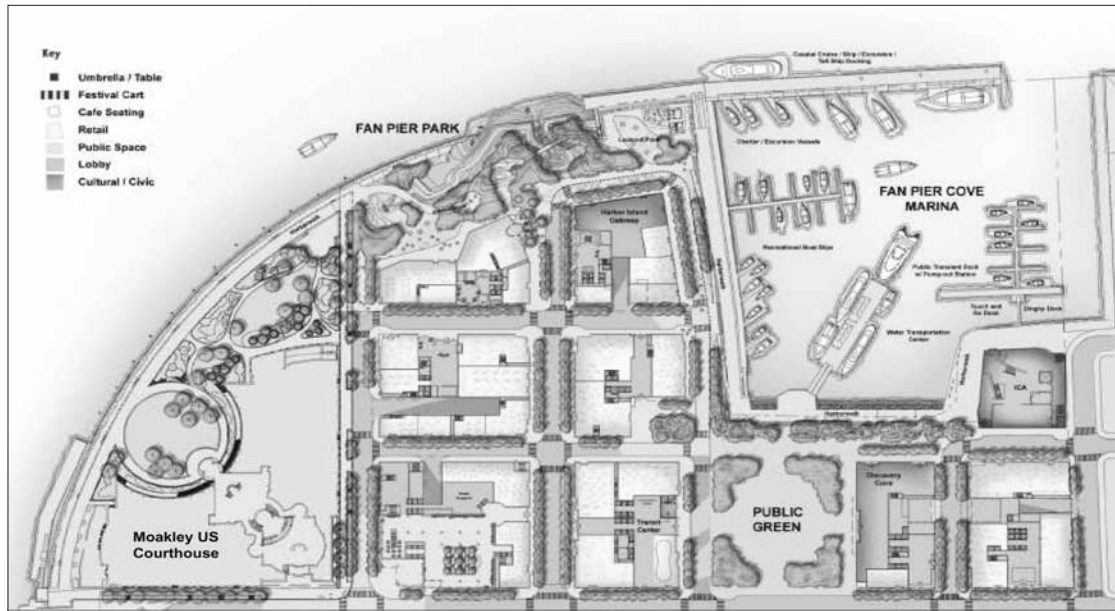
Residential Development Plans for the Fan Pier Section of the Seaport District.
